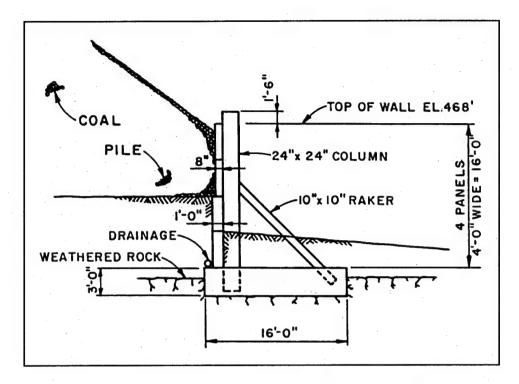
Typical precast panel section for Wall B at Indiana Power & Light coal storage facility (from PCI 1985)
